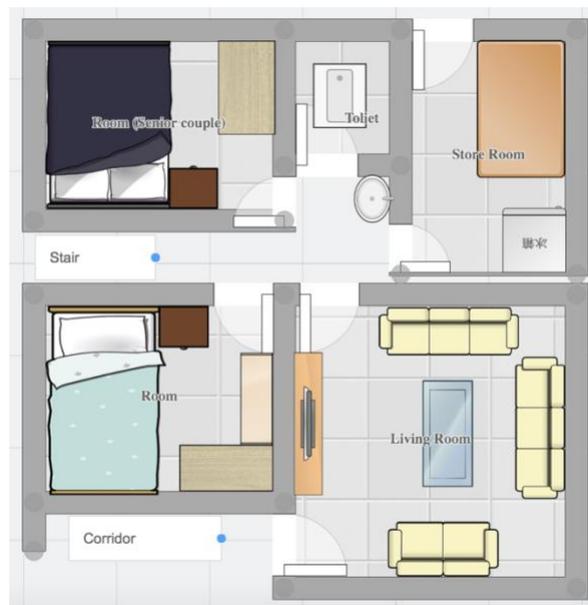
Plan of the house built in 1997 and 1998 (Ground floor)
